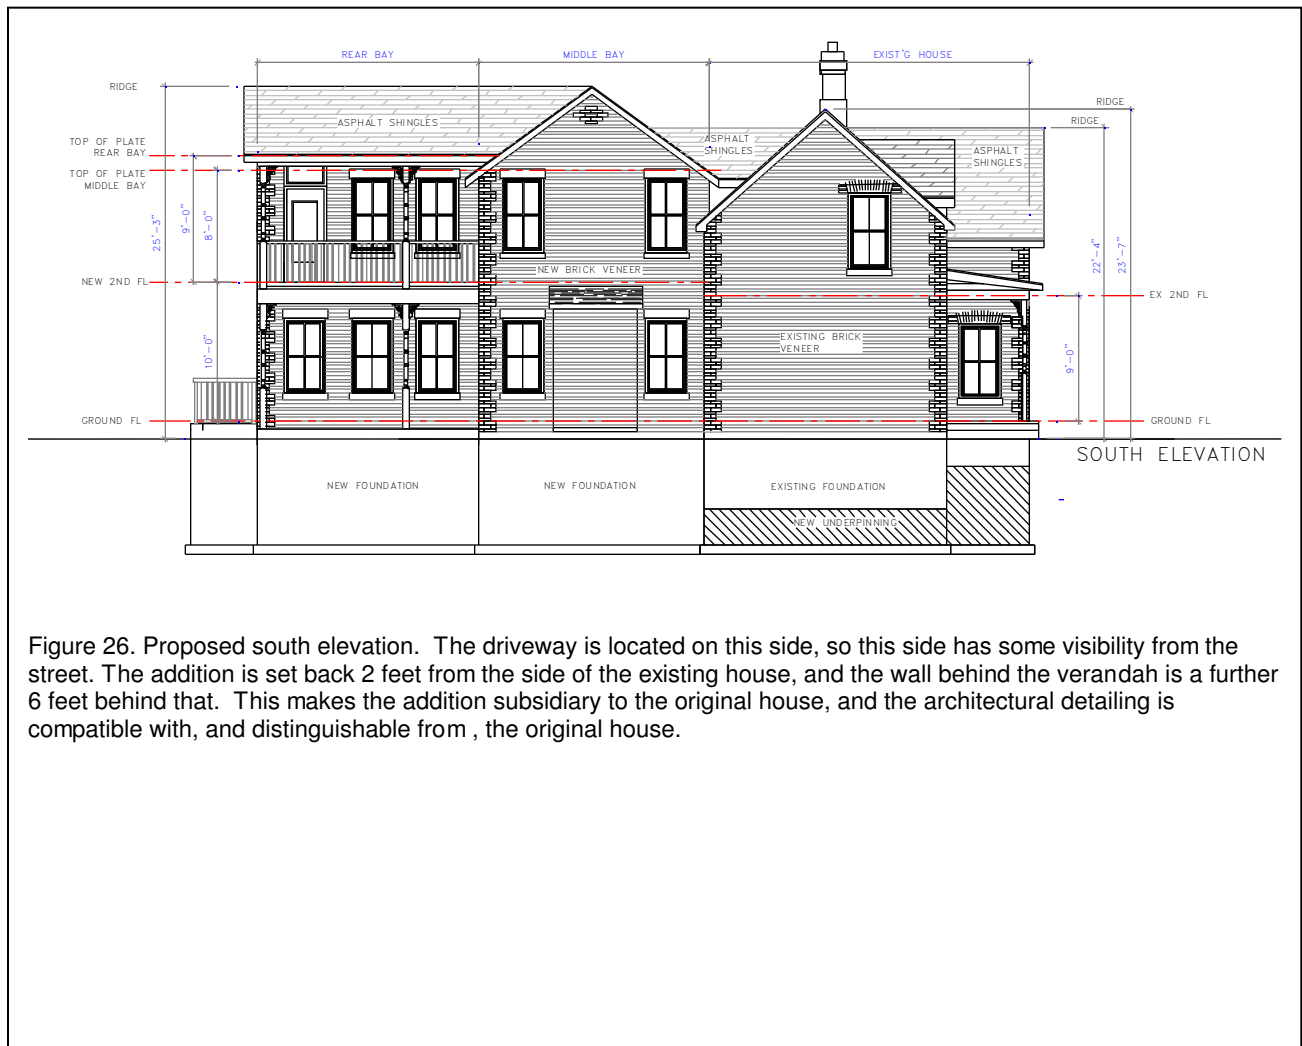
Proposed south elevation. The driveway is located on this side, so this side has some visibility from the street. The addition is set back 2 feet from the side of the existing house, and the wall behind the verandah is a further 6 feet behind that. This makes the addition subsidiary to the original house, and the architectural detailing is compatible with, and distinguishable from, the original house.
